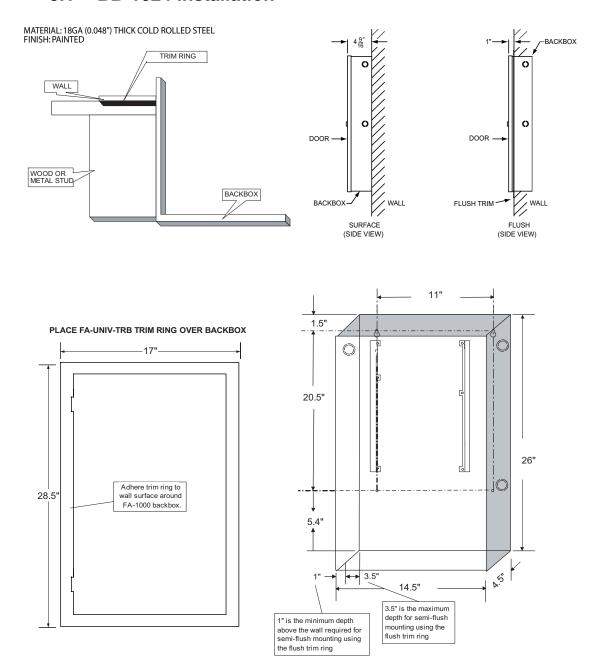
BB-1024 Flush or Surface Enclosure Installation and Dimensions
